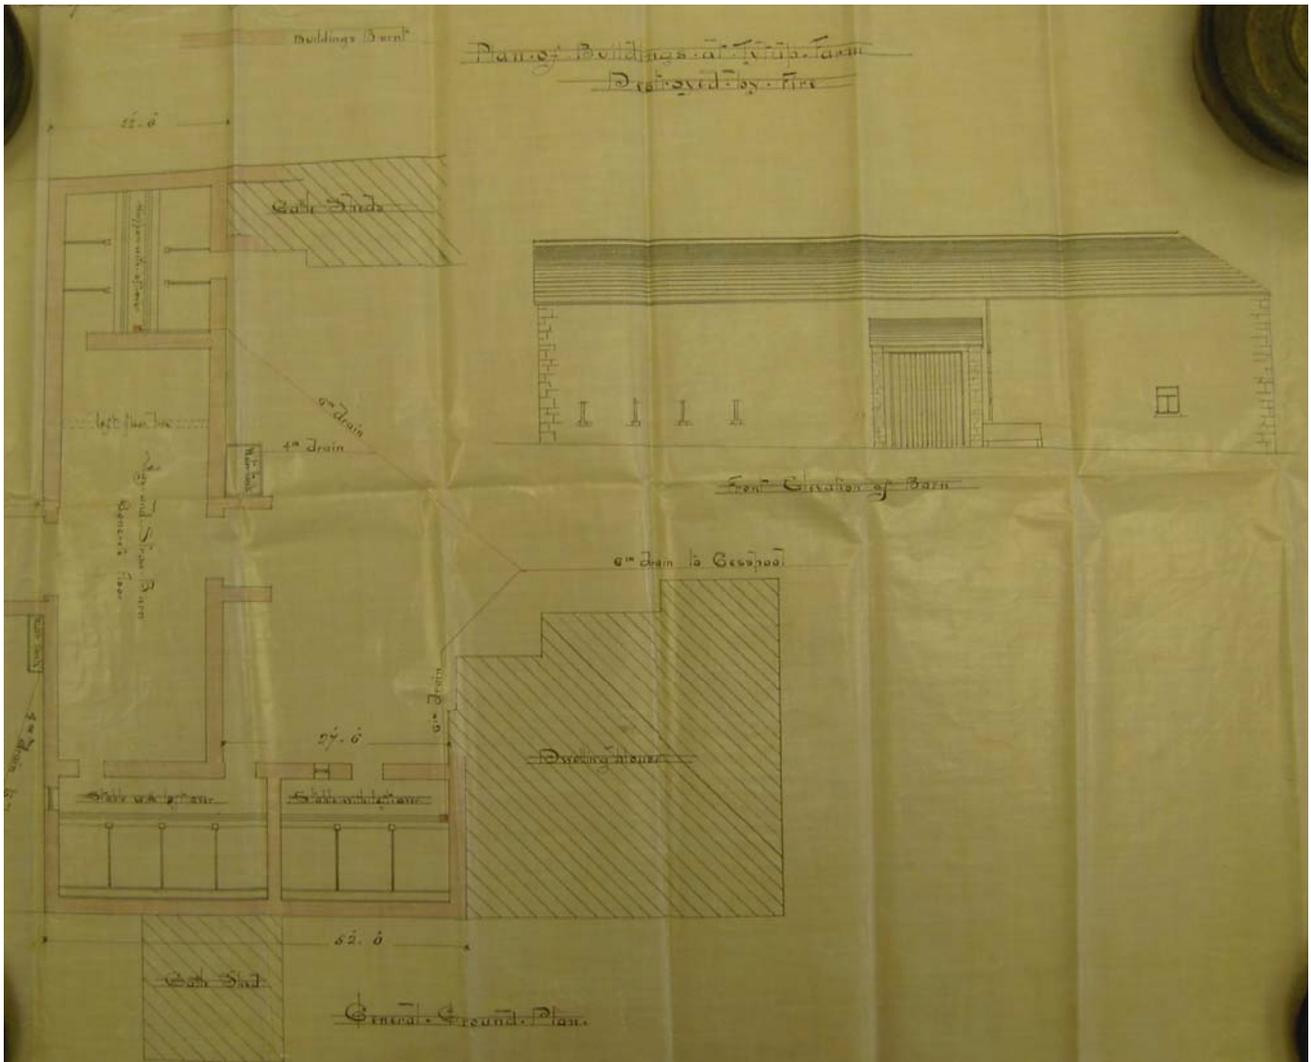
Plan of barns to be re-built after fire damage, dated 1891
